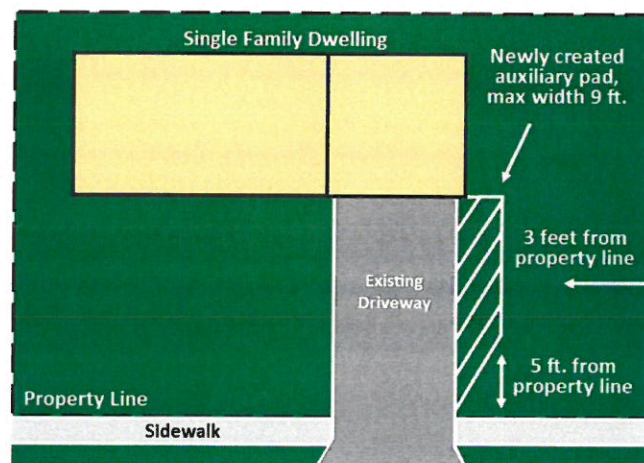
Permitted auxiliary parking pad for attached or detached garages.
